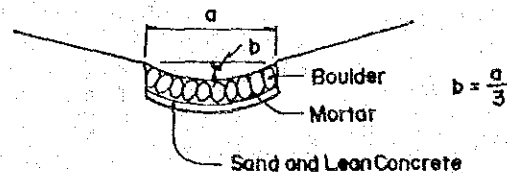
STONE PITCHING WATER CHANNEL
